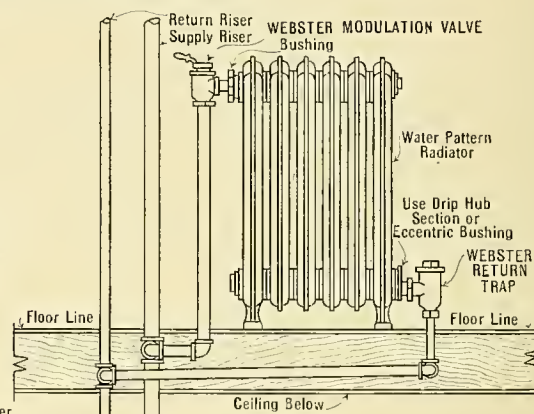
Arrangement of connections to a hot-water type radiator where the branch run-outs are in the floor construction
